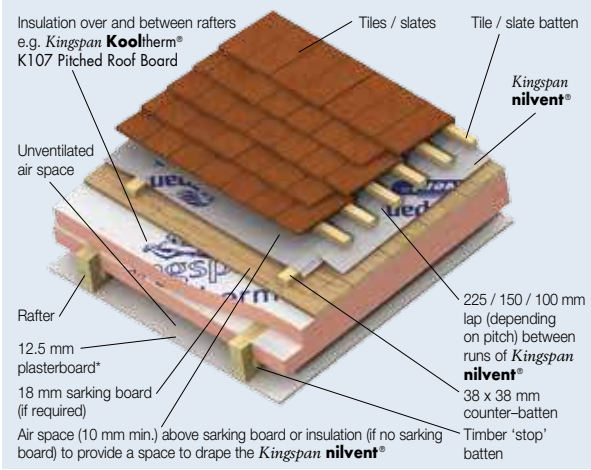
Insulation Over Rafters – Sarking Board / No Sarking Board – Battens & Tiles
